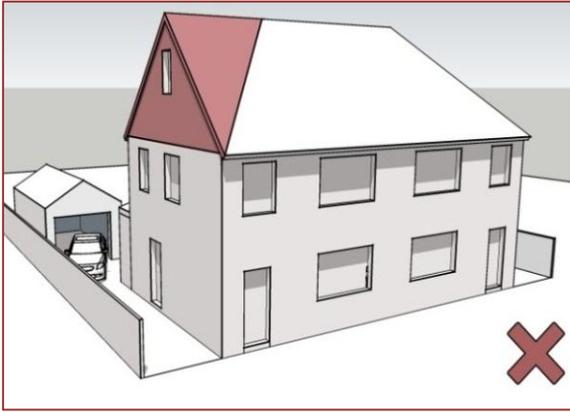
Roof extensions should not alter the pitch of the roof, such as this hip to gable extension
